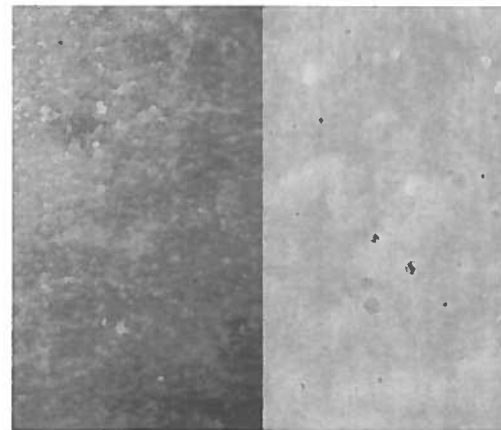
Surface appearance of concrete cast with CPF (left) and plywood formwork (right).
